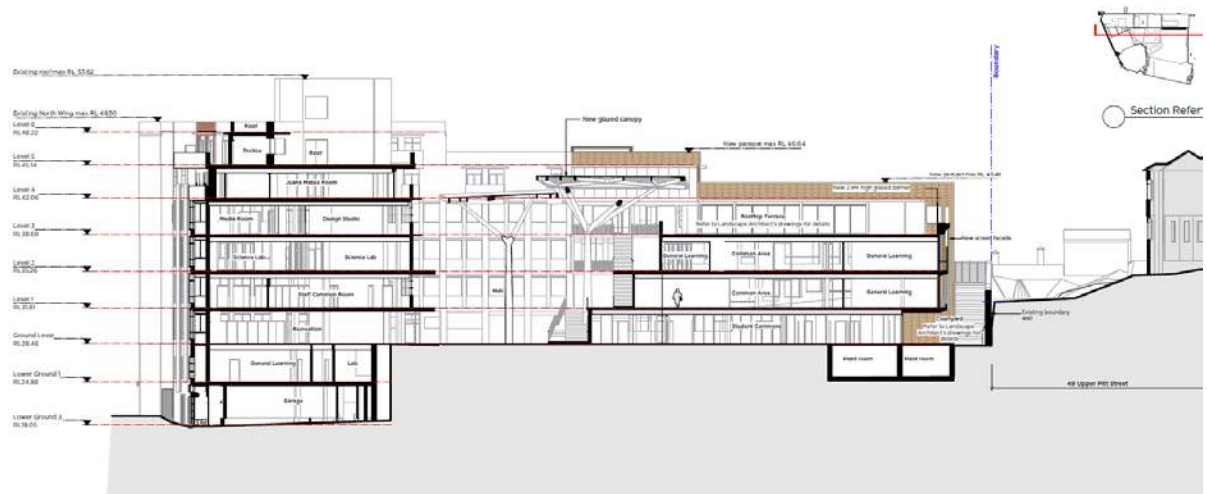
Draft east-west section through Main Campus Precinct showing proposed finished level of infill building (library area) and plant rooms below in east. Source: PMDL, February 2018.
